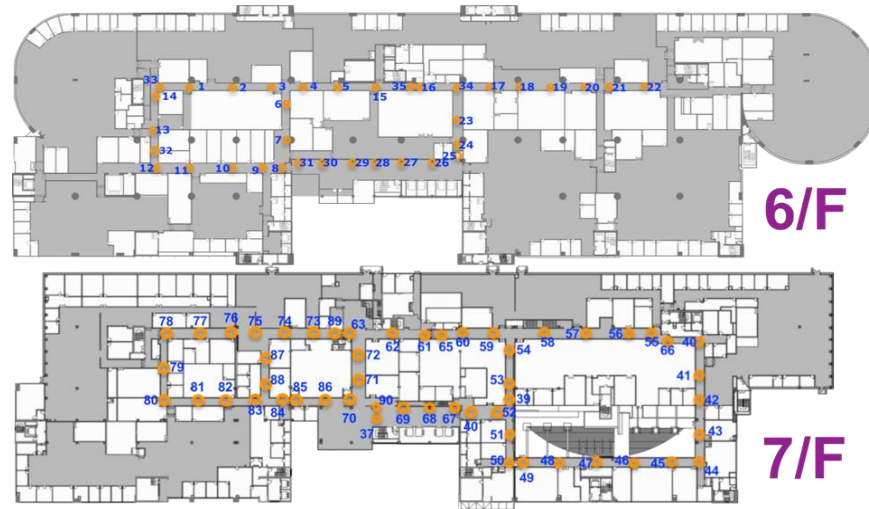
Floor plan of 6/F & 7/F of EMSD HQ with luXbeacon locations.
